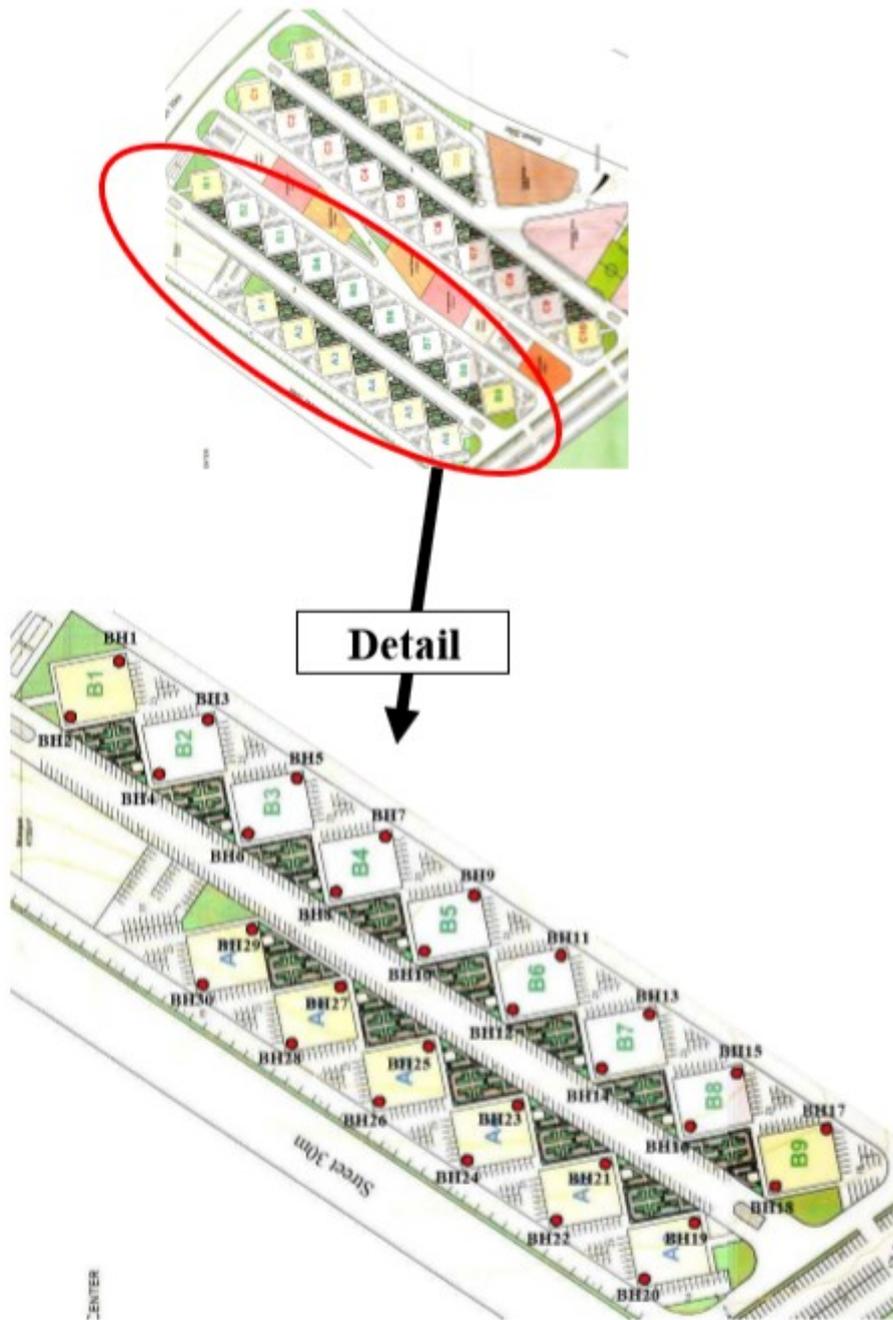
Site plan showing locations of the fifteen apartment buildings with locations of the boreholes.
